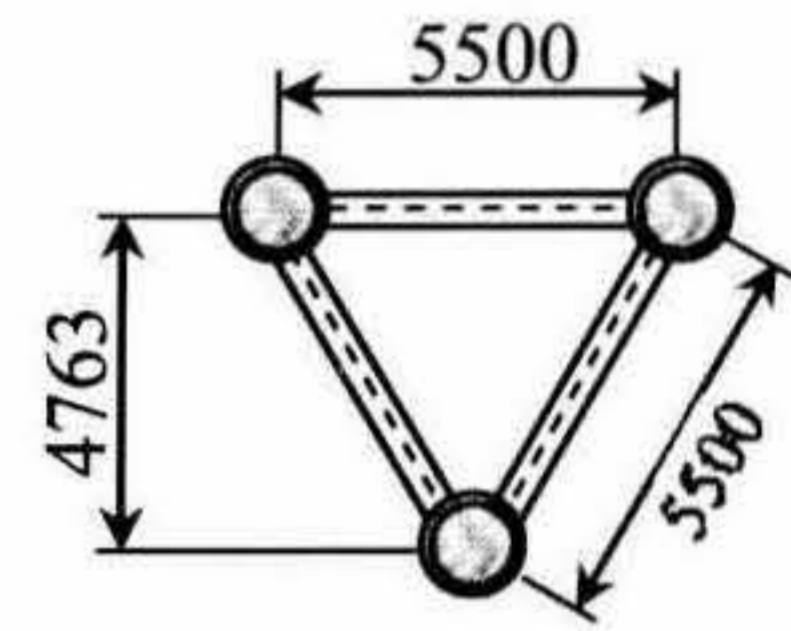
Arco del Escudo Bridge (Šavor & Bleiziffer 2008)
